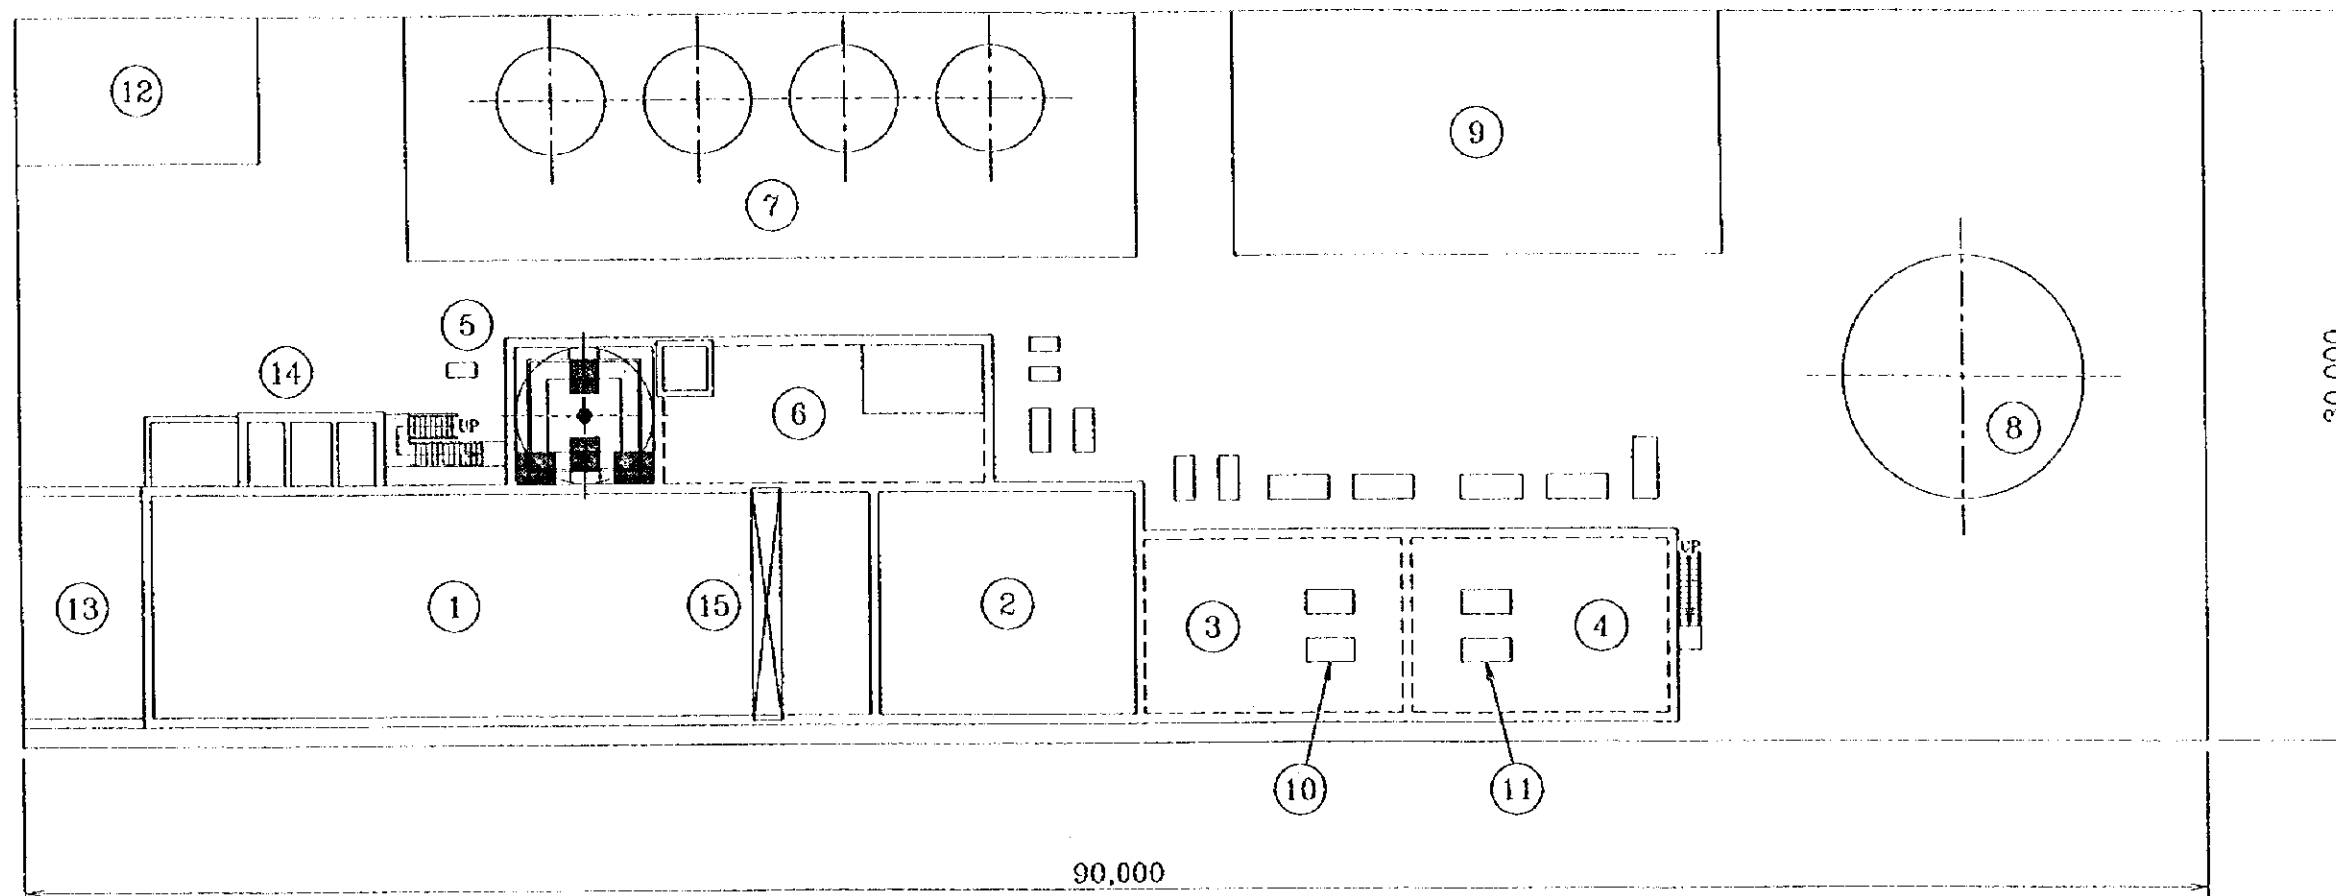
Layout of Desalination Plant and Raw Water Receiving Station
